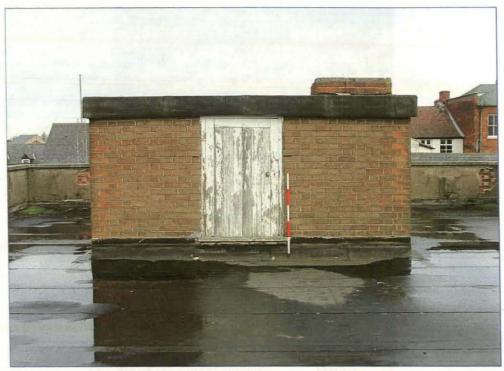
View looking north-west of small building on roof which houses the water tanks and access ladder (Scale = 1m)
